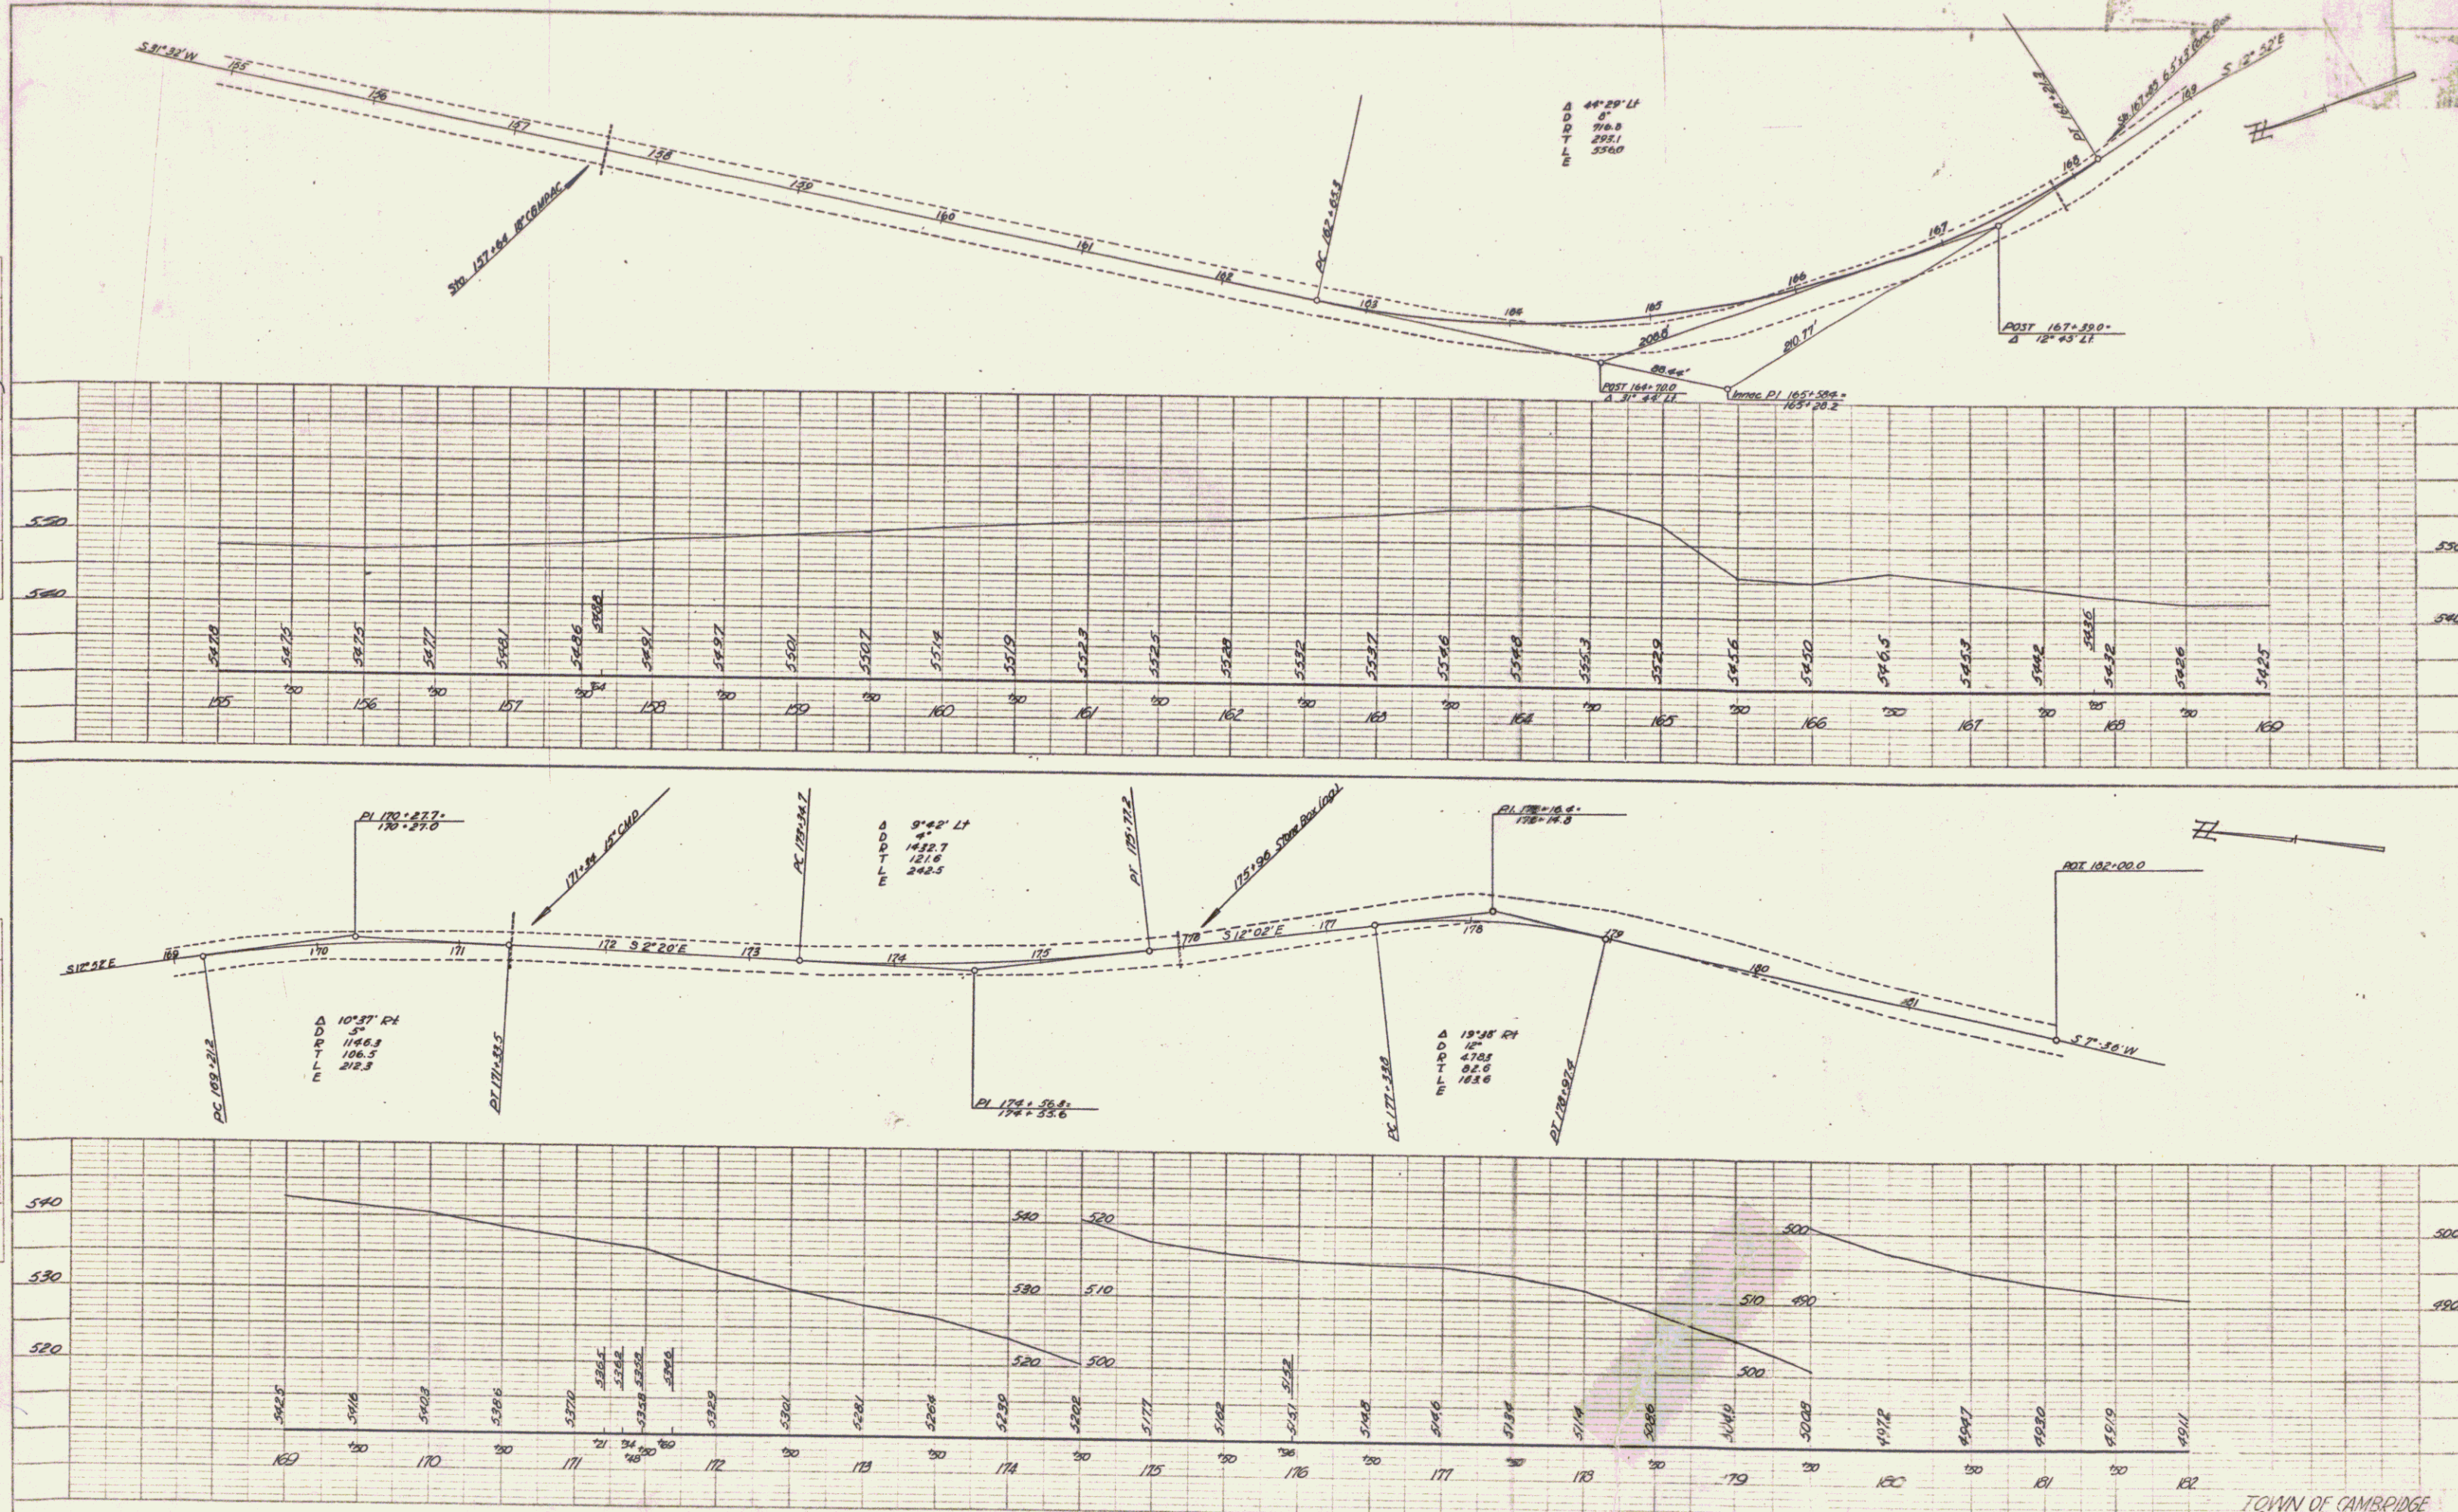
PLAN PROFILE OF BAKER'S ROAD
